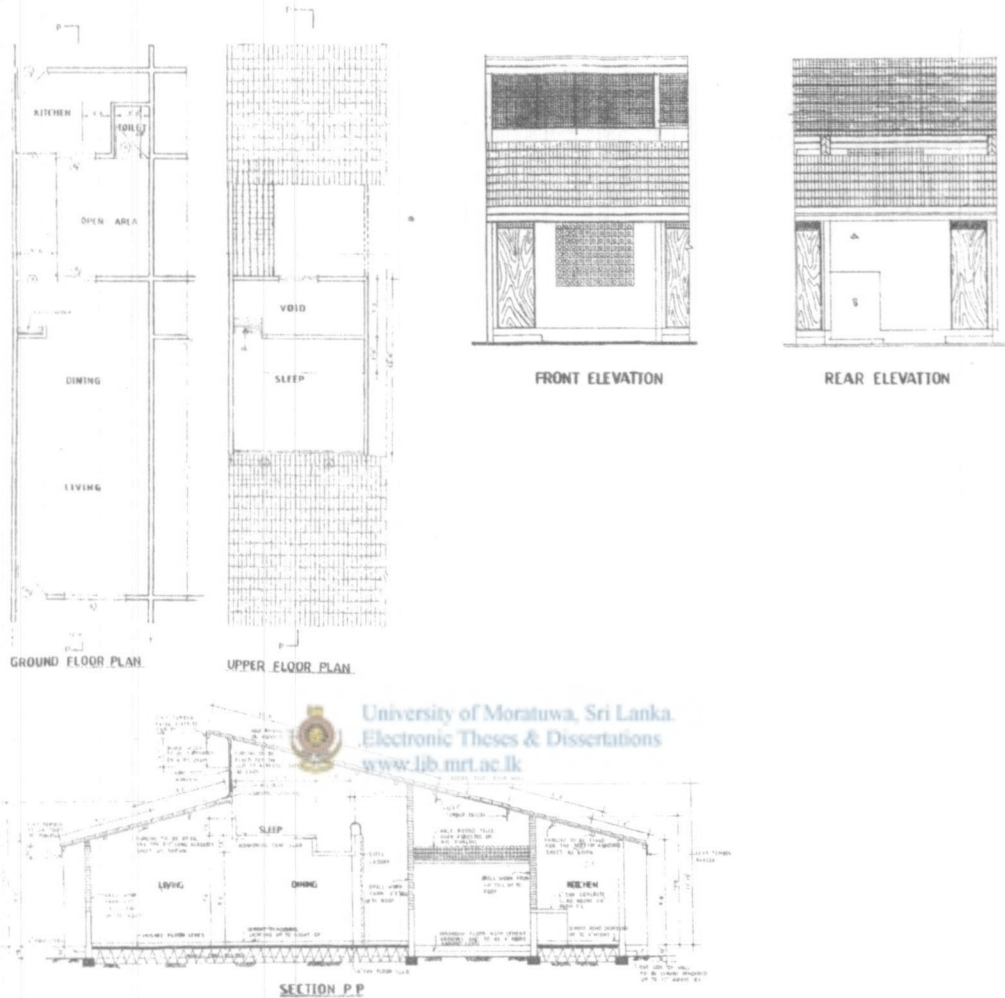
Original plans, section and elevation of D-type house at Jayawadanagama Housing scheme. (not to scale)
